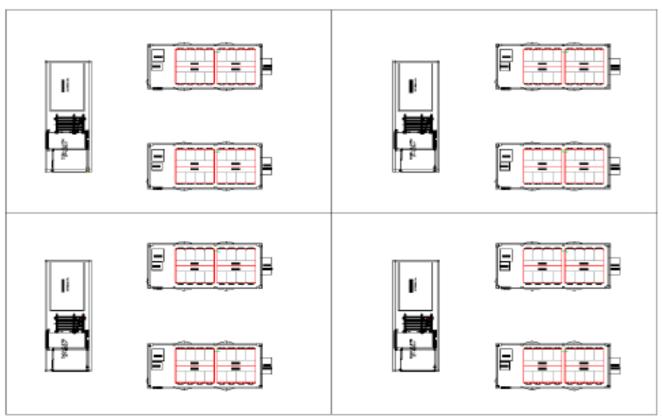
Layout of energy storage power system (subject to the actual layout on site)
